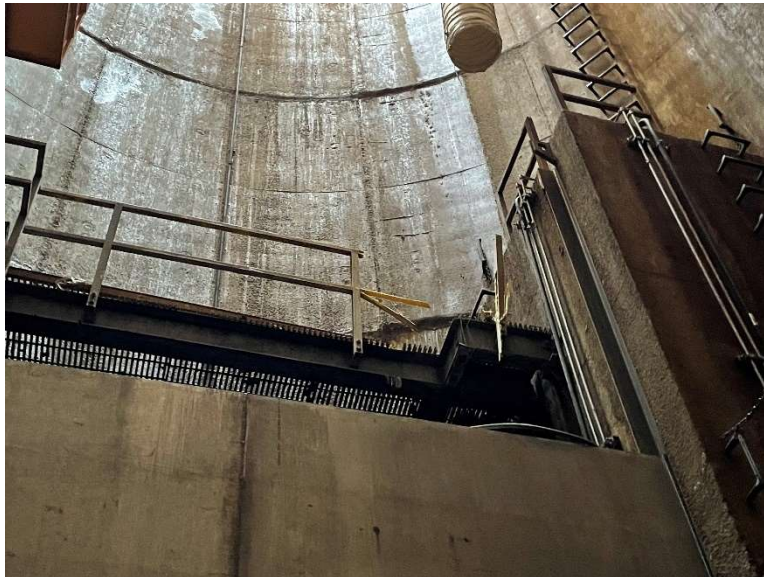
Damaged handrail directly above gate structure (facing upstream)
